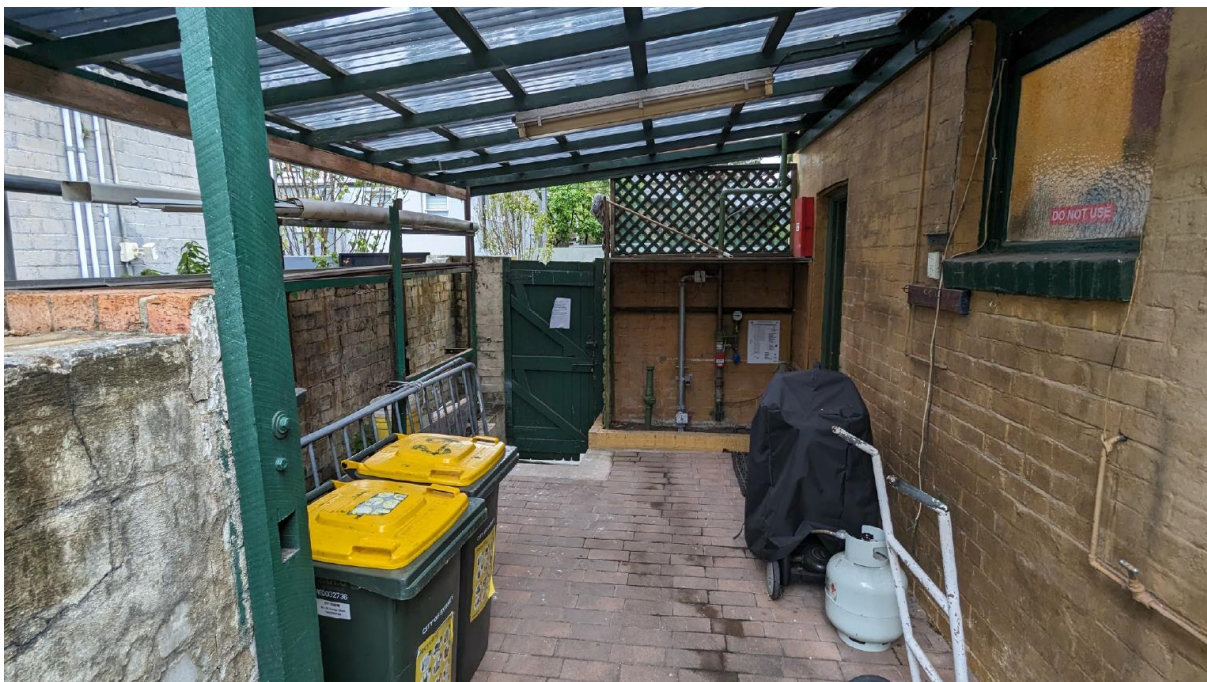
Undercover waste storage area within rear setback of 62-64 Selwyn Street with side access to Josephson Street
